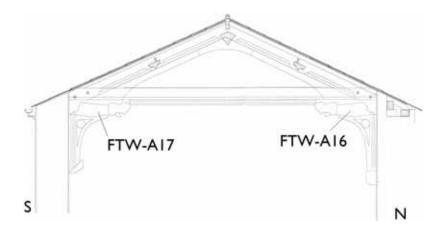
East elevation of truss 8 (based on truss 2), showing the location of samples FTW-A16 and FTW-A17 (Freeland Rees Roberts Architects)
